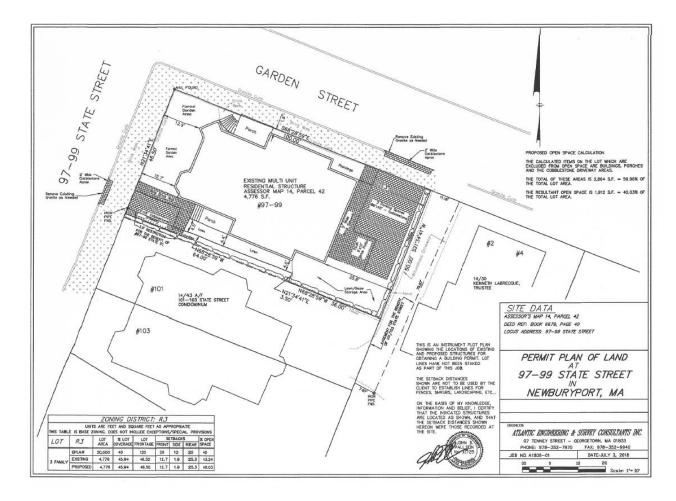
Proposed Site Plan showing Improvements for 97-99 State Street
